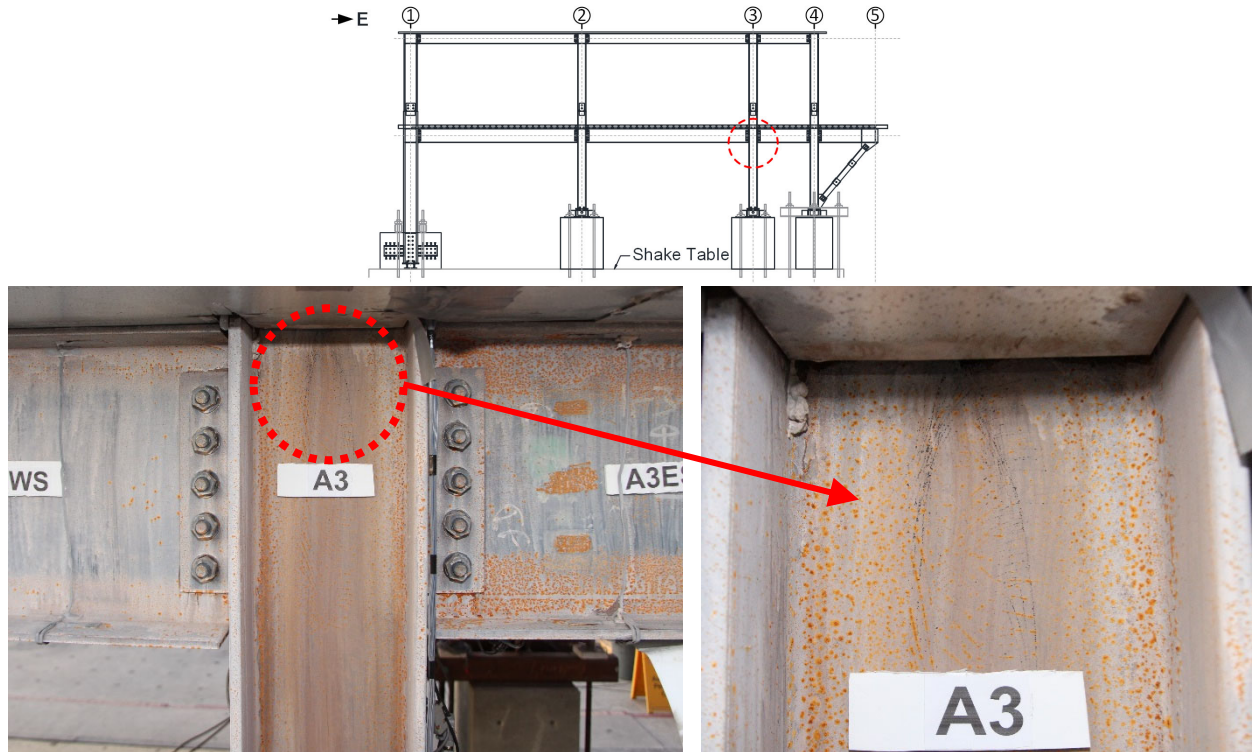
After Test 2B-5: Minor Flaking of Whitewash in Column Panel Zone of 2<sup>nd</sup> Floor BW Connections
